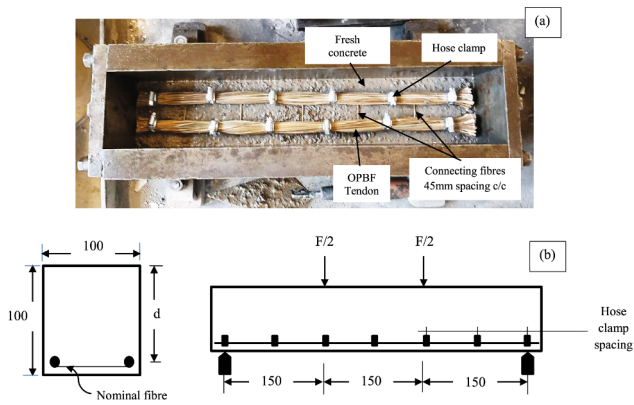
(a): Illustration of OPBF tendon reinforcement in mould (b) Cross-section and longitudinal sections of an OPBF reinforced concrete sample.
